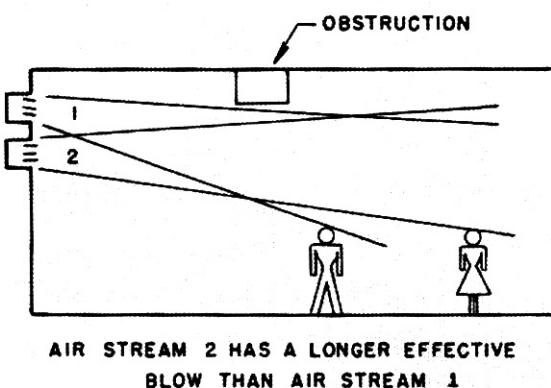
Wall Outlet in Room With Ceiling Obstruction
